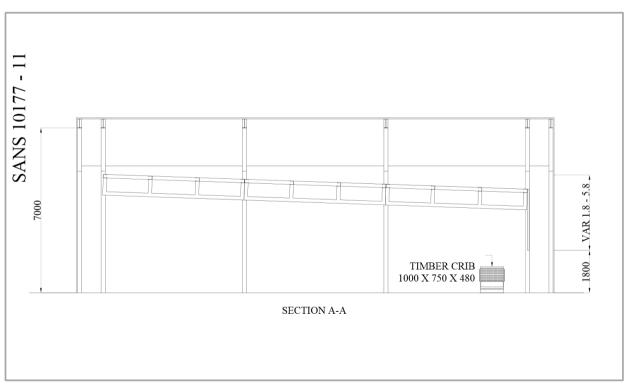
Typical roof test installation in the SANS 10177 - Part 11 facility
